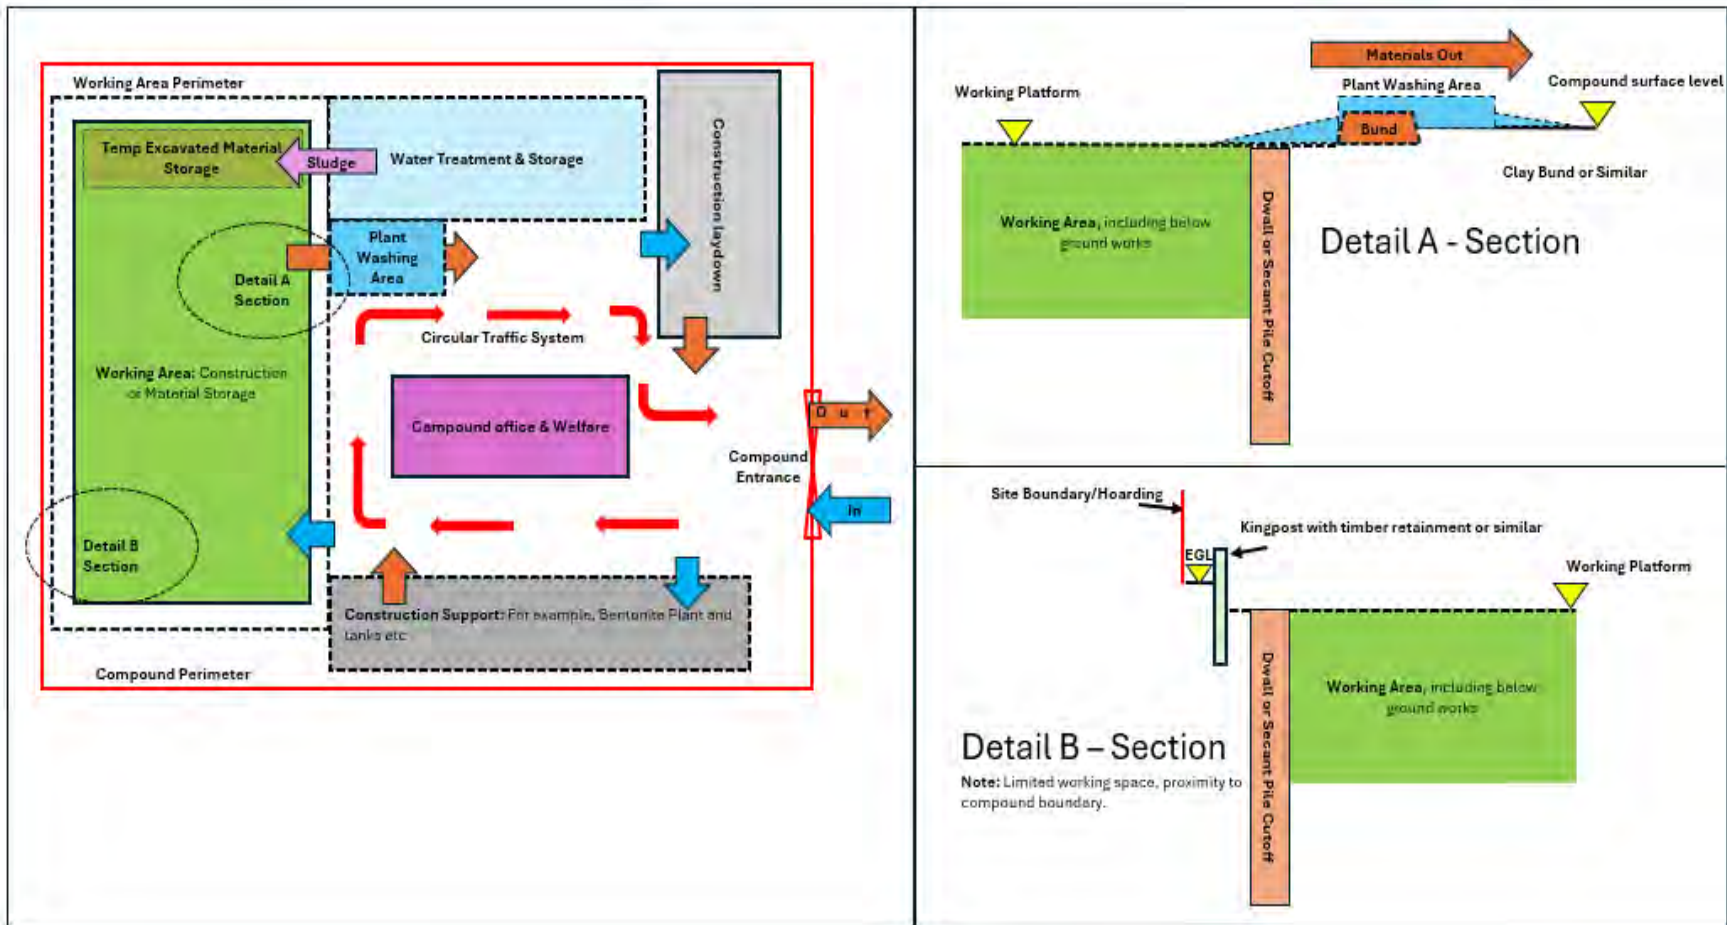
Typical Layout Dublin Airport Compounds during excavation phase.
